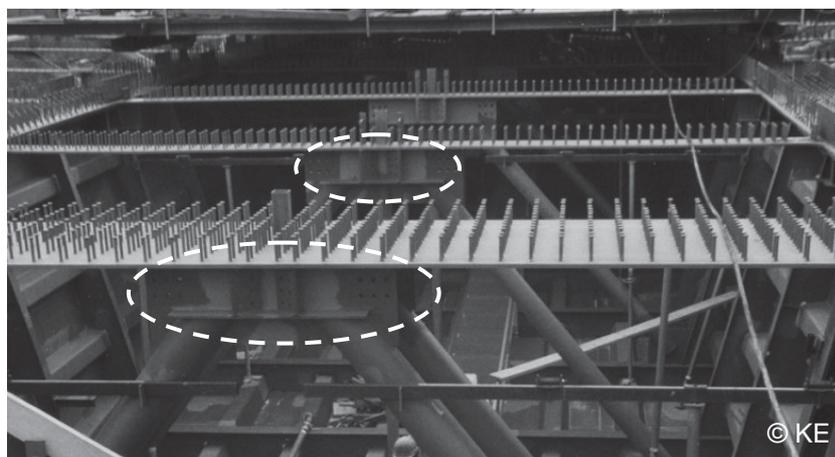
Joints foreseen to take the horizontal bracings in case of slab exchange.
